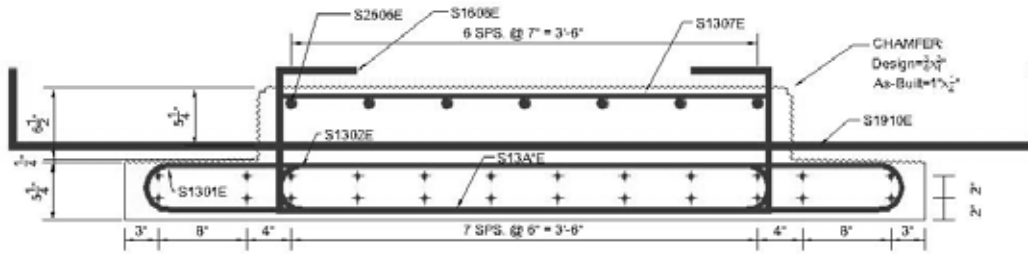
As-built cross section and reinforcement details for east end of Beam 2S
